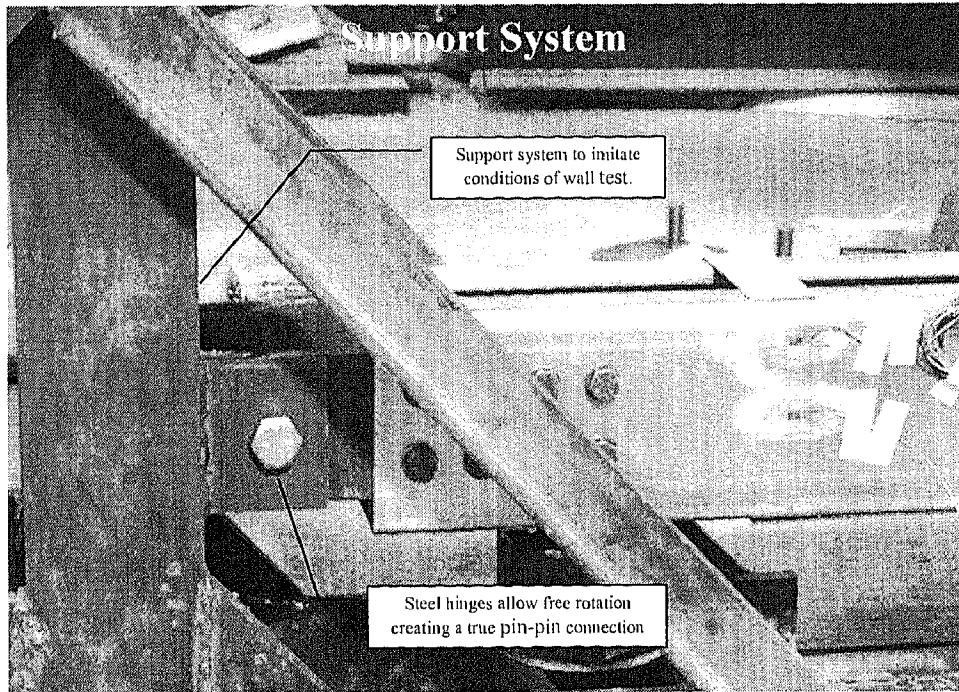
Steel Hinge Specimen in Testing Apparatus
